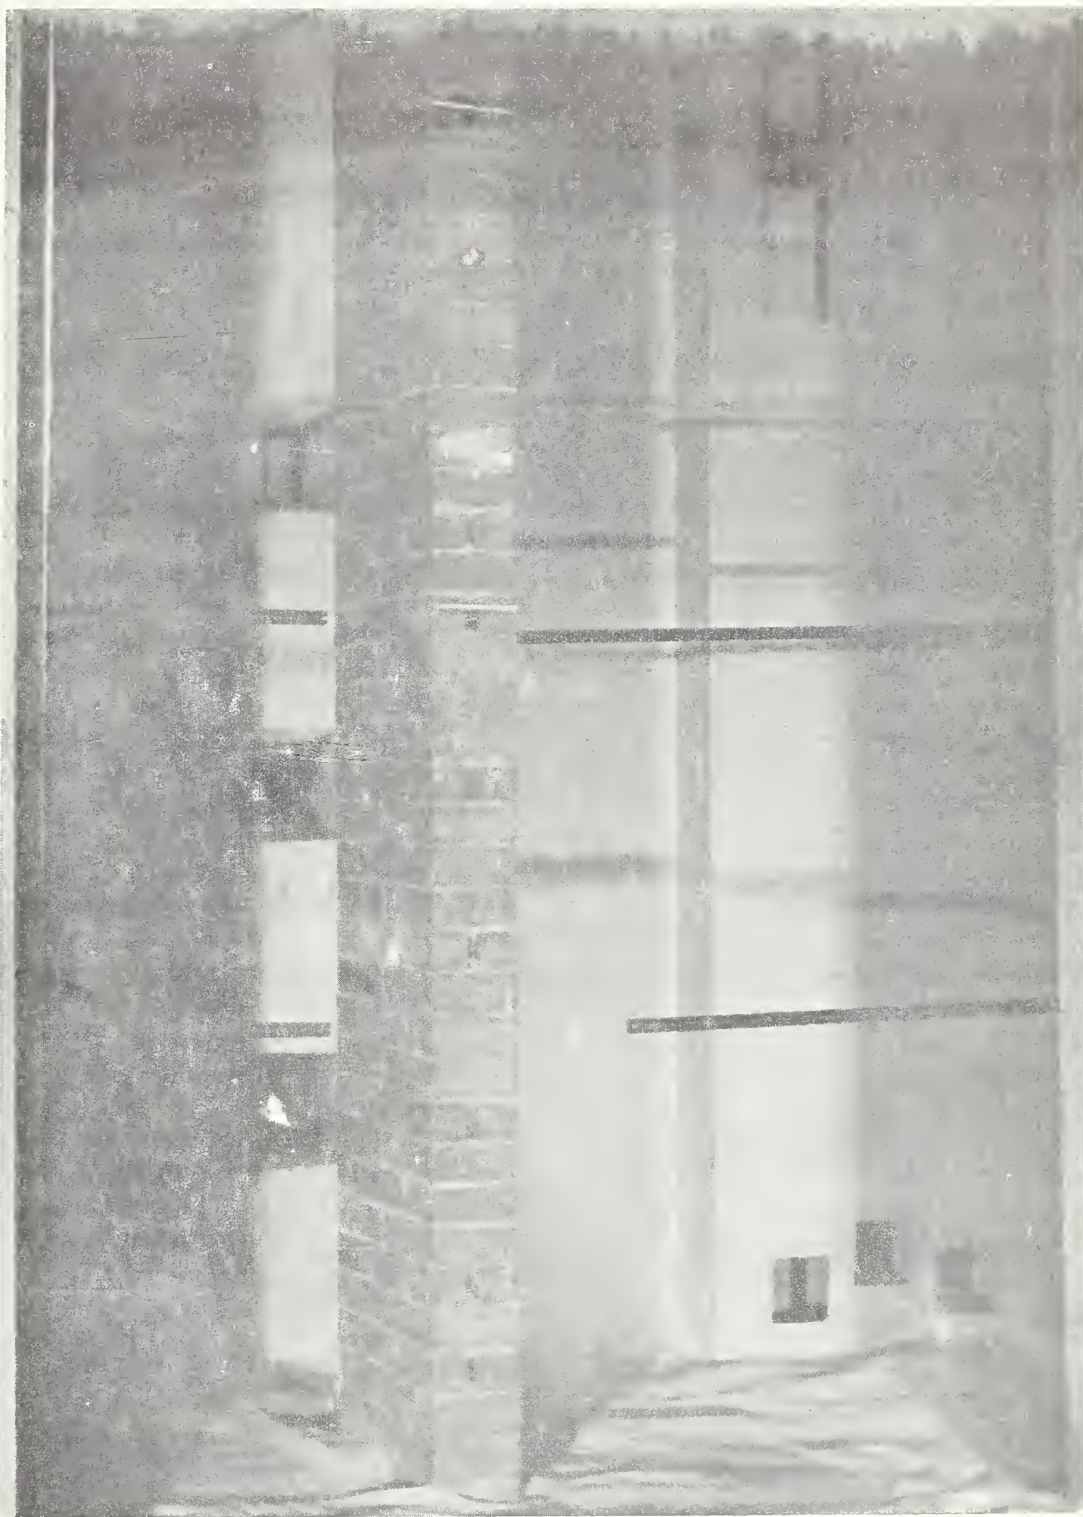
Wall Column Specimen in Furnace Prior to Test
